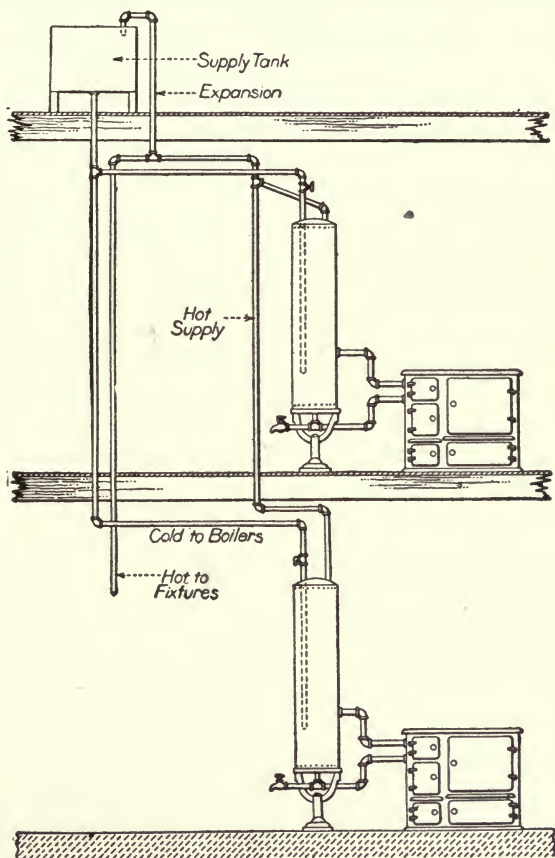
Two Boilers and Heaters Connected to a Common Supply Line.
